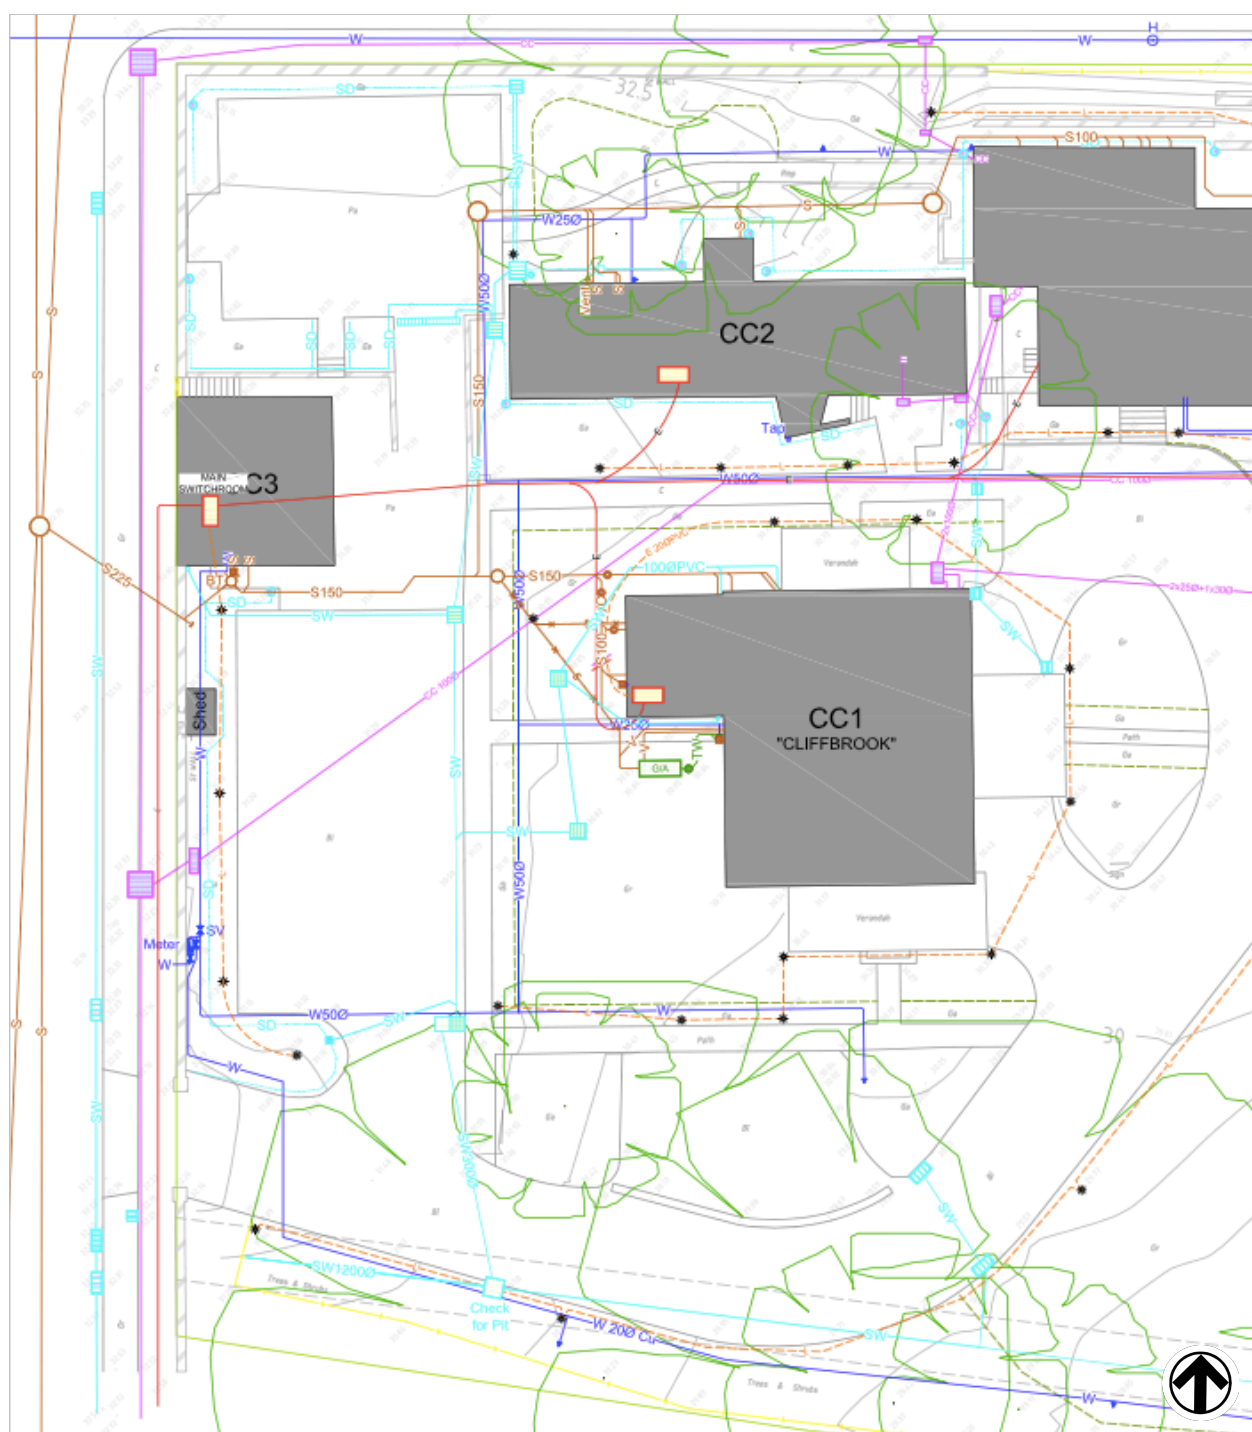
10 UNSW Cliffbrook Campus Consolidated Services Plan (June 2014)
